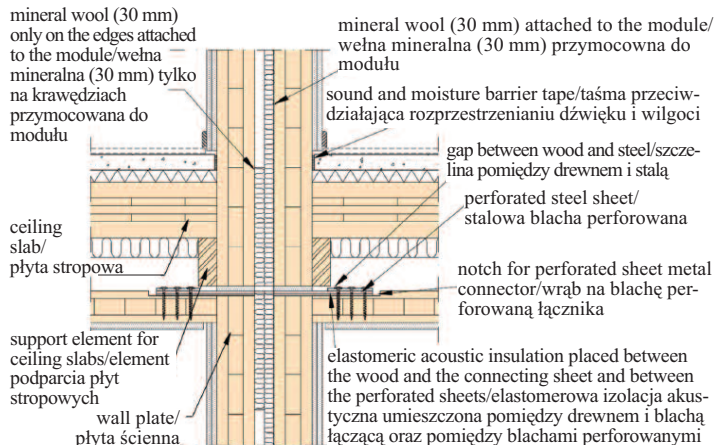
Horizontal connection of the panel system in the module using perforated sheet metal, screws and acoustic insulation [23]
